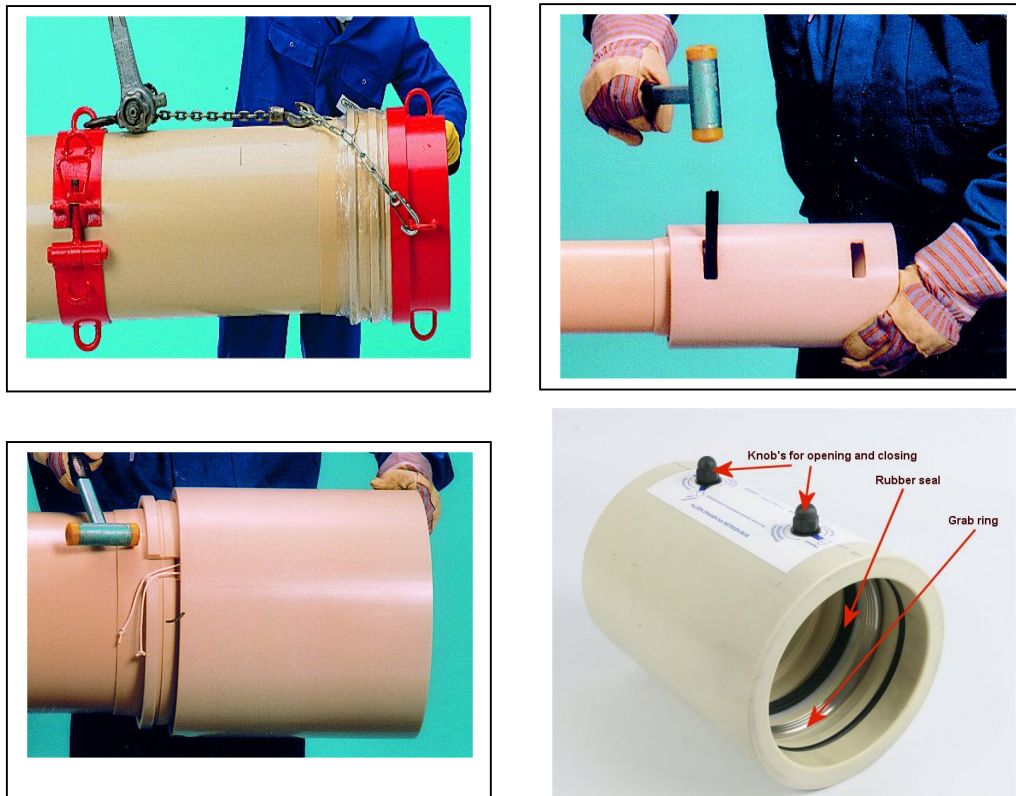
Assembly of the collar, assembly of Type 3, assembly of Type 4 and Type 5
